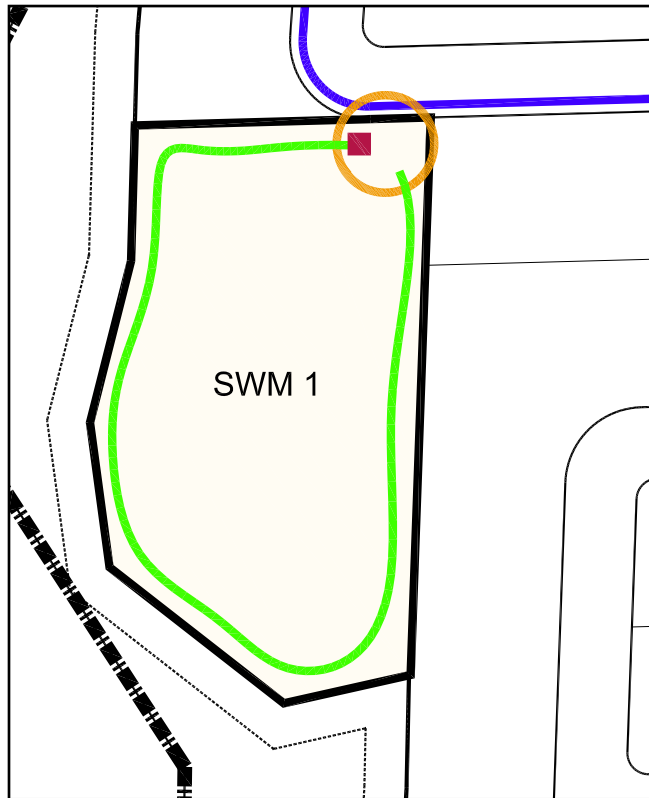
SWM Pond #1 Facility Fit Concept
